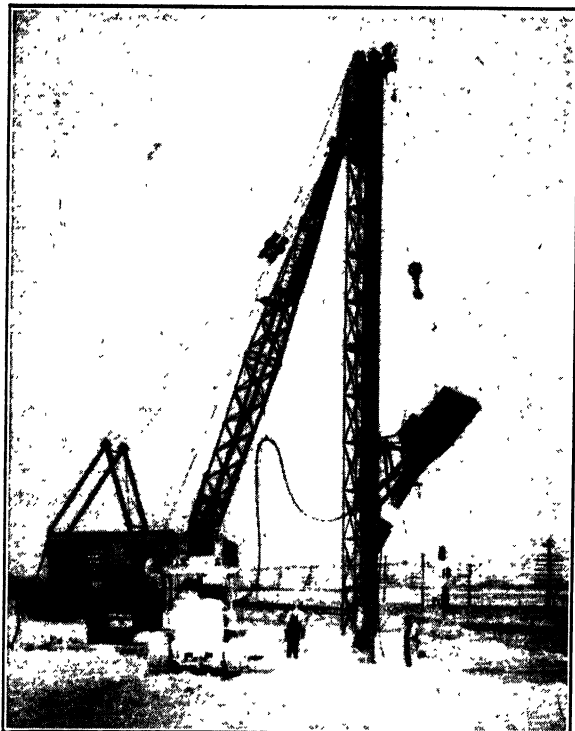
25-ft-long sand-drain hollow mandrel about to be filled with sand from the loading skip. (Courtesy of O. J. Porter.)
